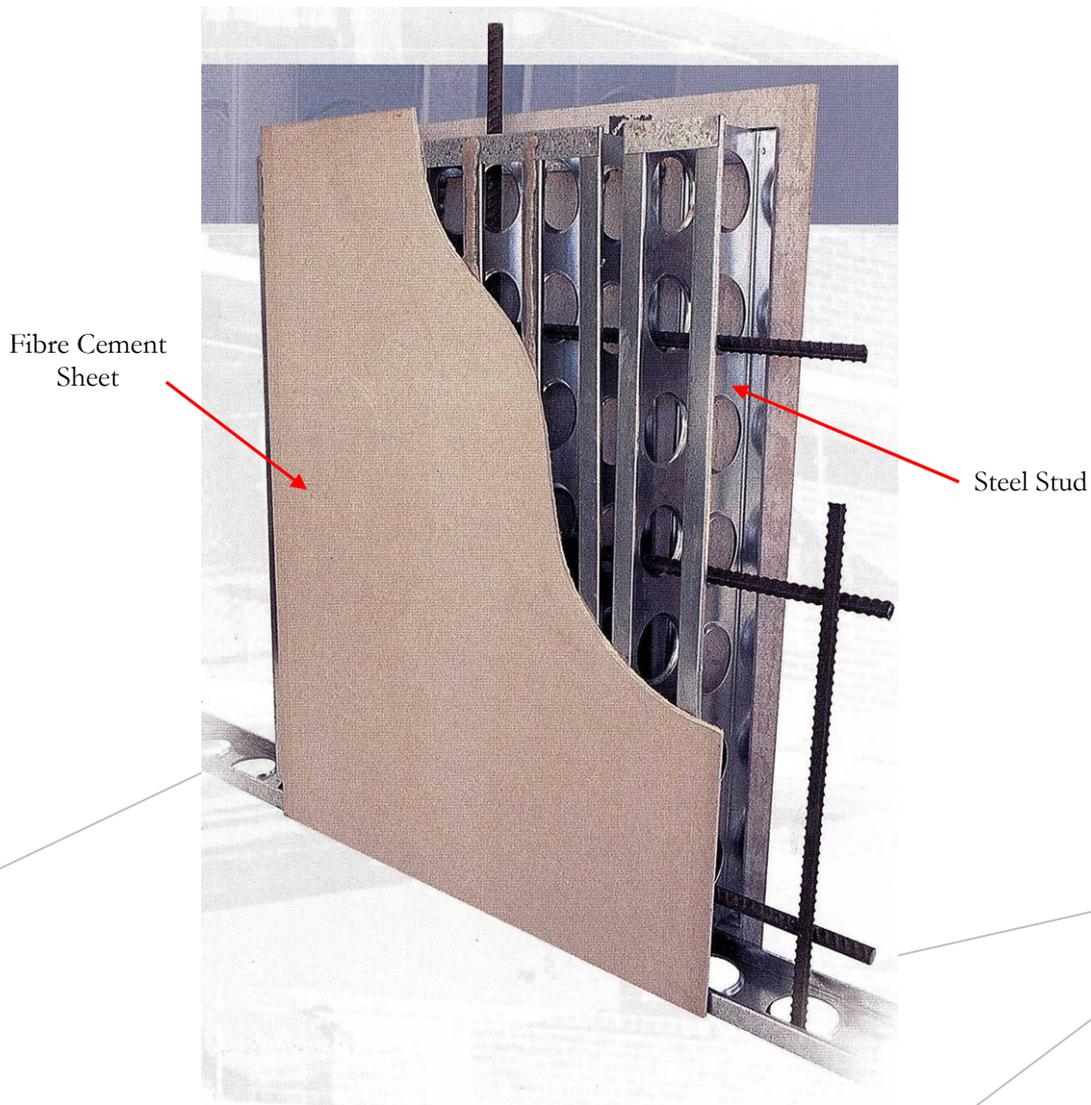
Elevation of the AFS permanent formwork wall panel system
